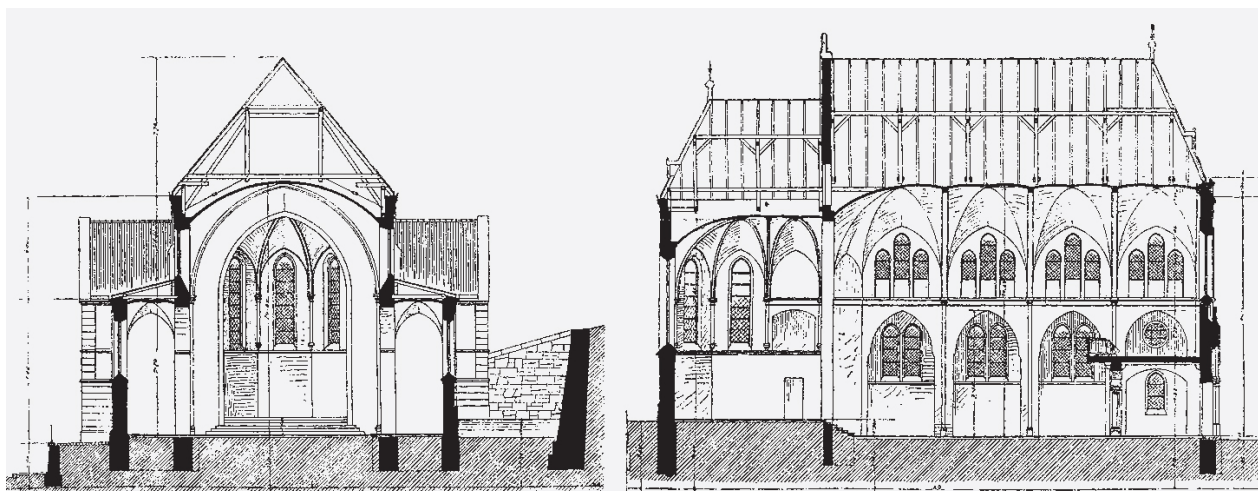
The convent church of Saint Anthony of Padua, Bistrik: cross and longitudinal section view, segment of the second project, with apse on the east and access bridge on the north, done by Josip Vancaš (Damjanović 2014, 106)
